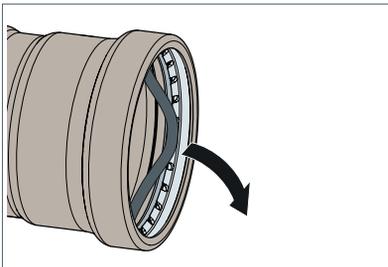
Removal of the sealing element from XL press connectors – 64.0–108.0 mm
